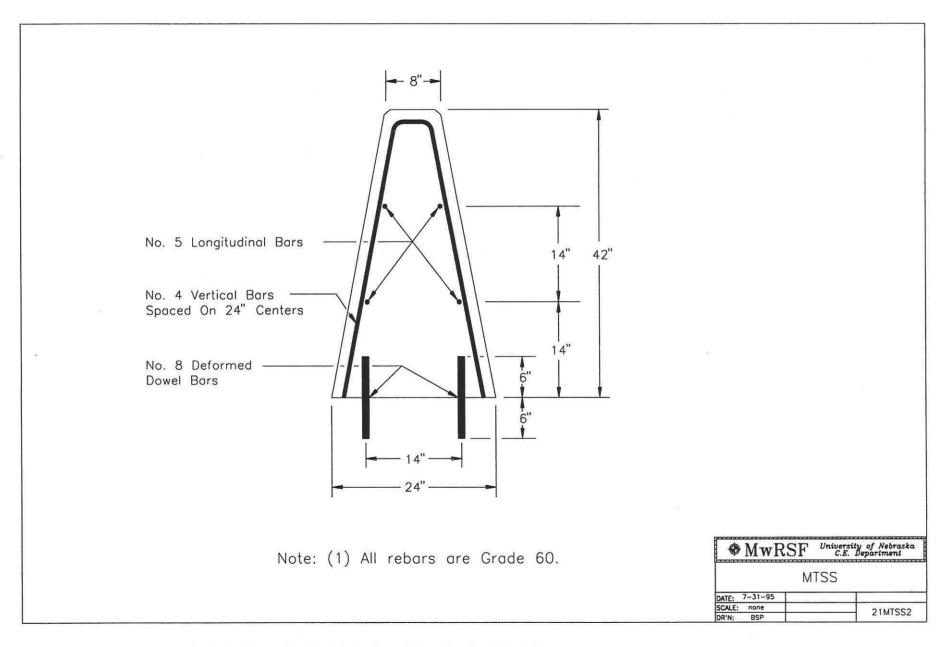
Cross Section of Single Slope CMB with Reduced Longitudinal Reinforcement.
